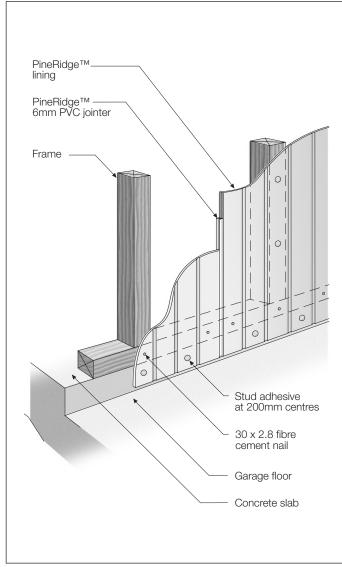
GARAGE SLAB EDGE STEP DOWN
